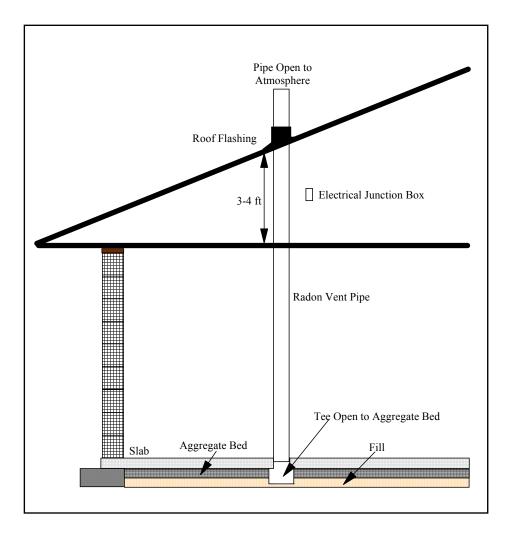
Basic passive stack design for nonresidential buildings with attics.
